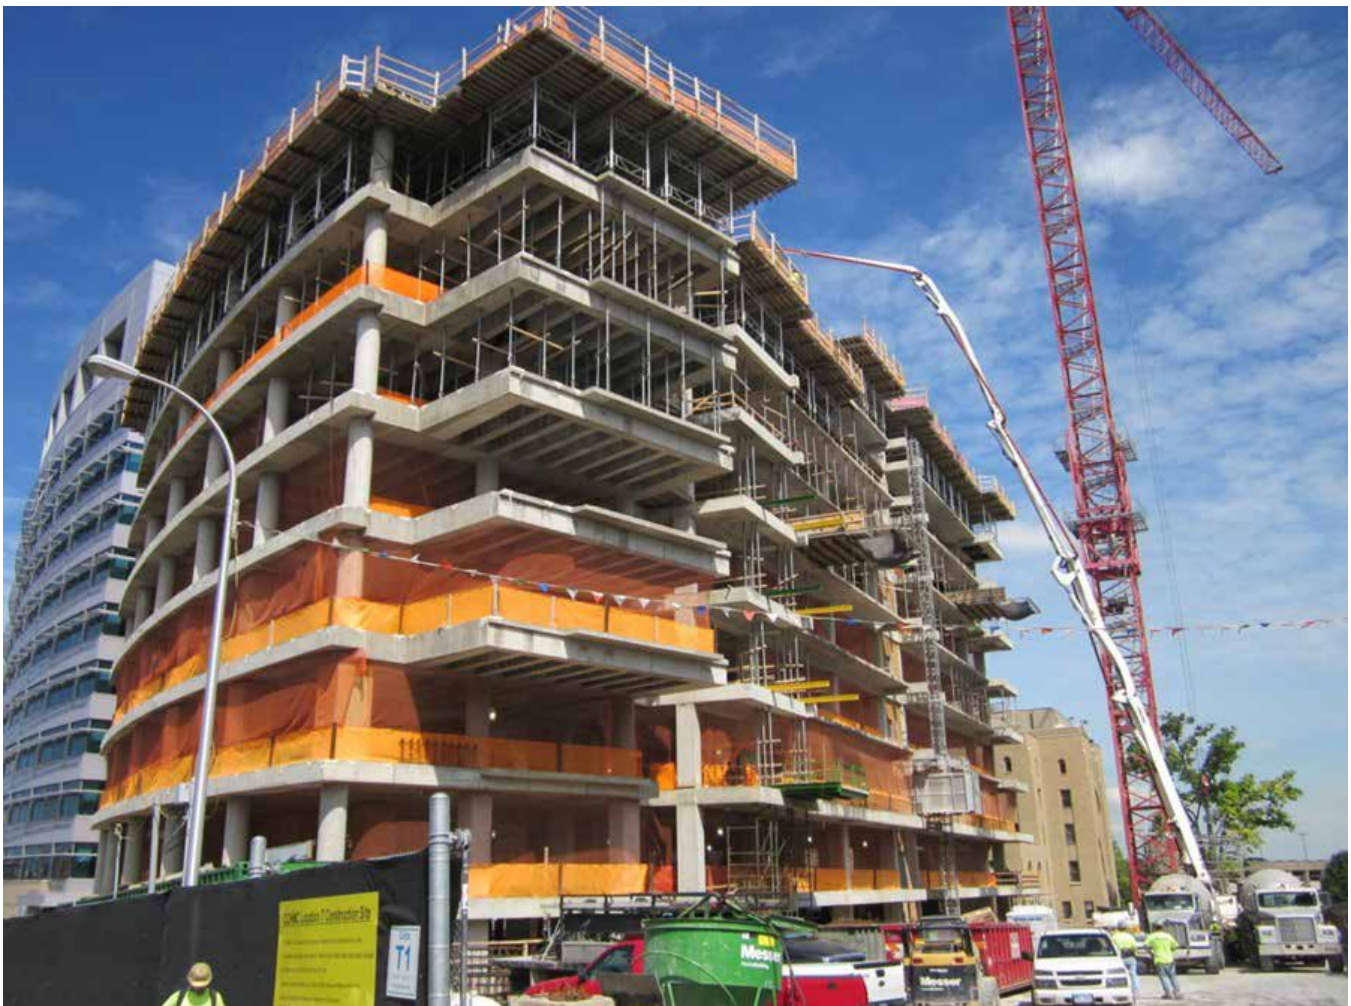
Through early collaboration with experienced concrete contractors, designers can optimize designs to take full advantage of the unique features of concrete construction. (Image courtesy of Ceko Concrete Construction.)
